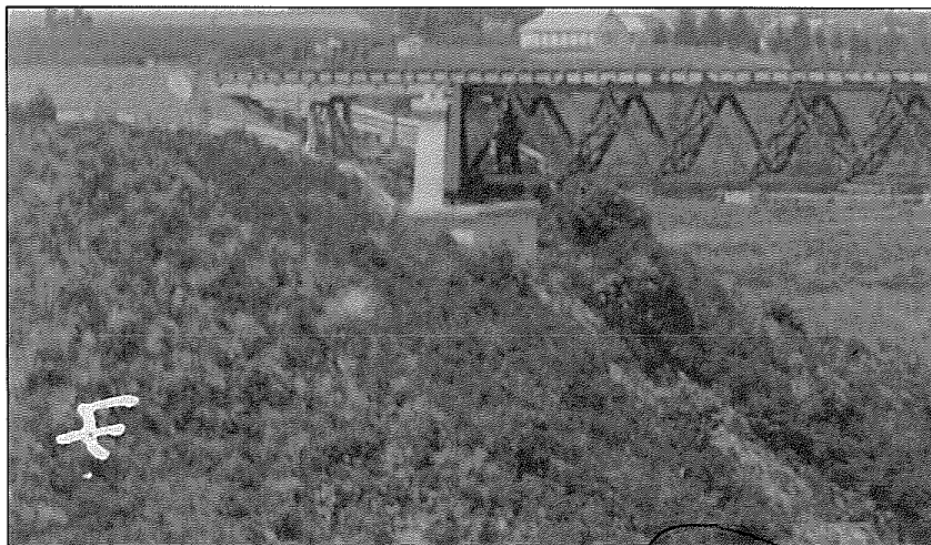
OPOIA PA AND JESMOND PARK CIRCA 1884-1889; VIEW SOUTH EAST (Alexander Turnbull Library 1/2-096152-G). (Note: abutment embankment earthworks and corrugated iron fence).
